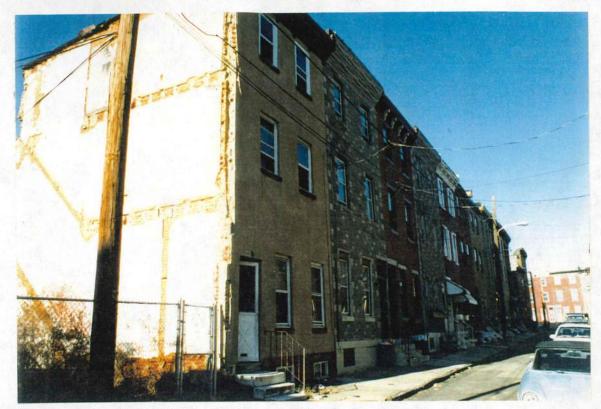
A: Stucco Facing, filled transom, brick completely refaced, cornice repainted, small windows in original openings, permastone veneer and cornice.
